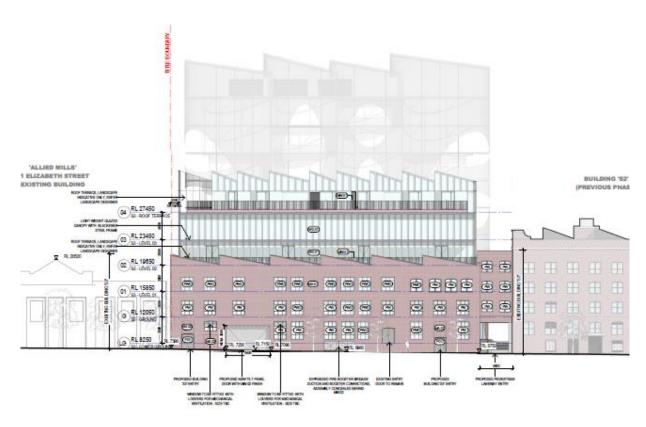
, East elevation, Elizabeth Street (Woods Bagot June 2020)
